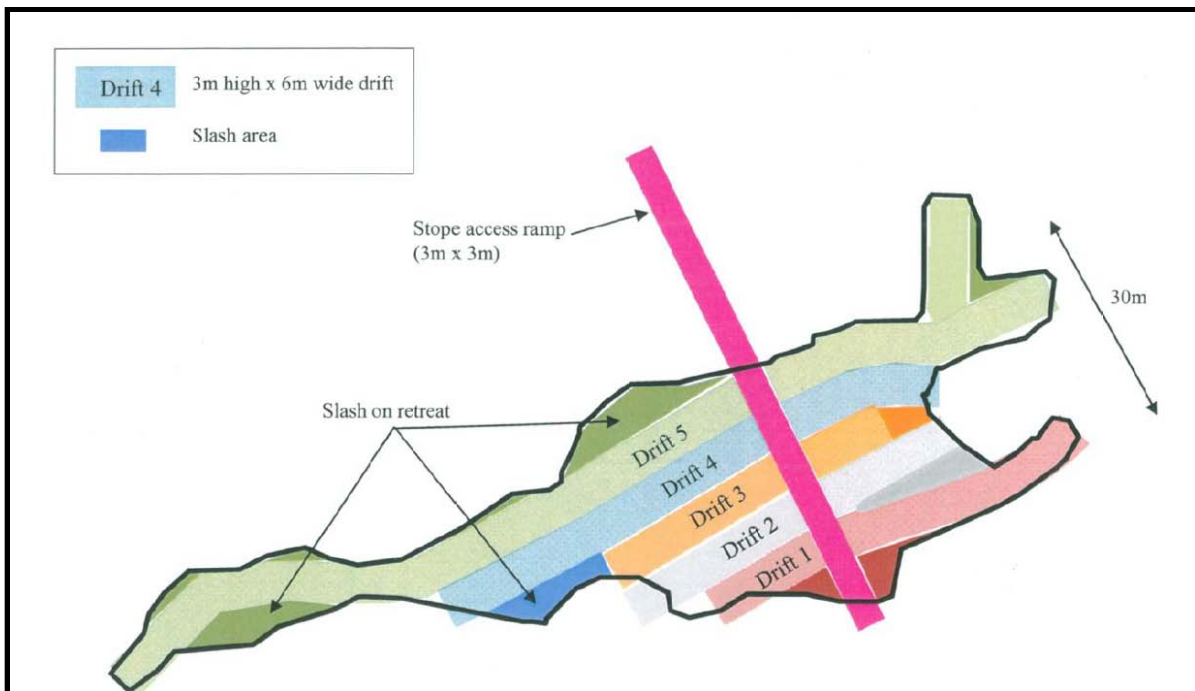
Plan Section through a Typical Drift and Fill Stope
